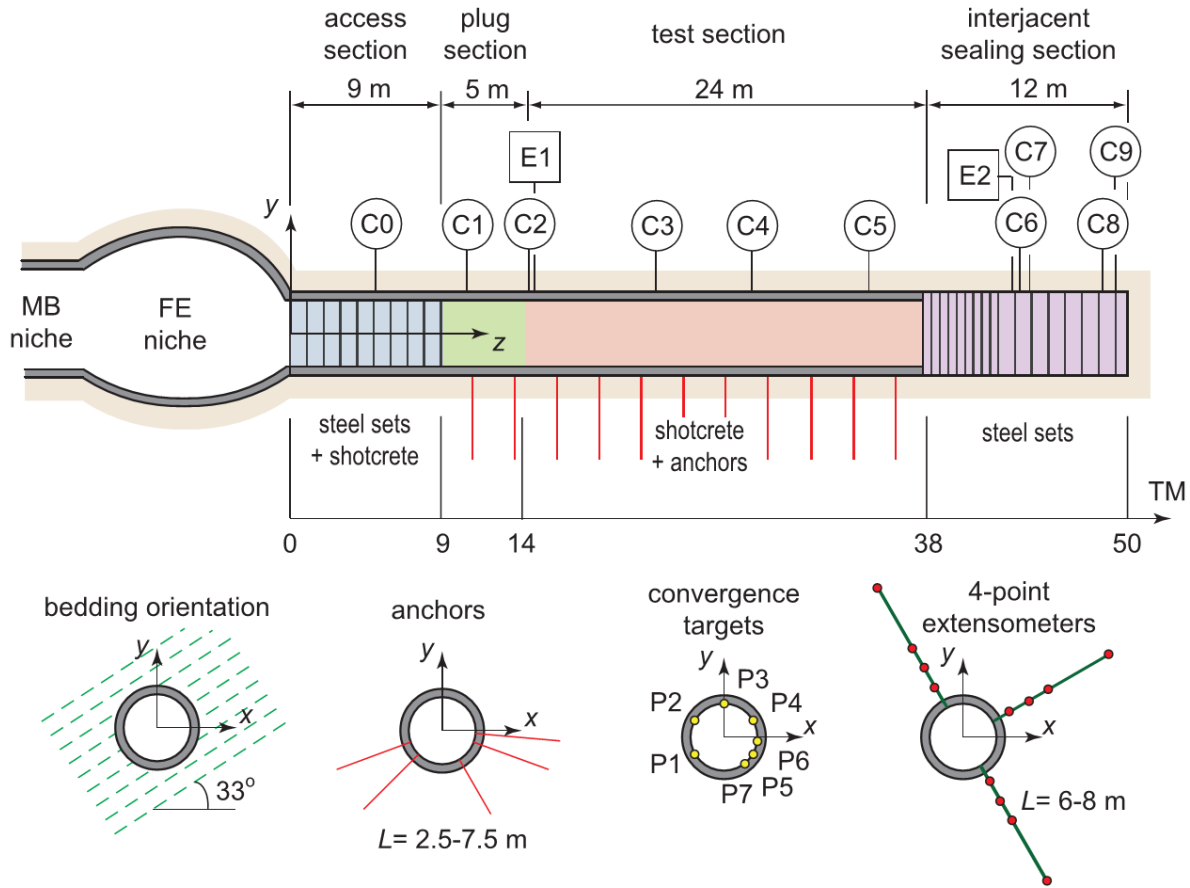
Schematic of simplified longitudinal section showing different support sections, convergence measurement sections (C0 – C9) and location of radial extensometers (E1 and E2) installed during tunnel construction, (adapted from Lisjak et al. 2015)
